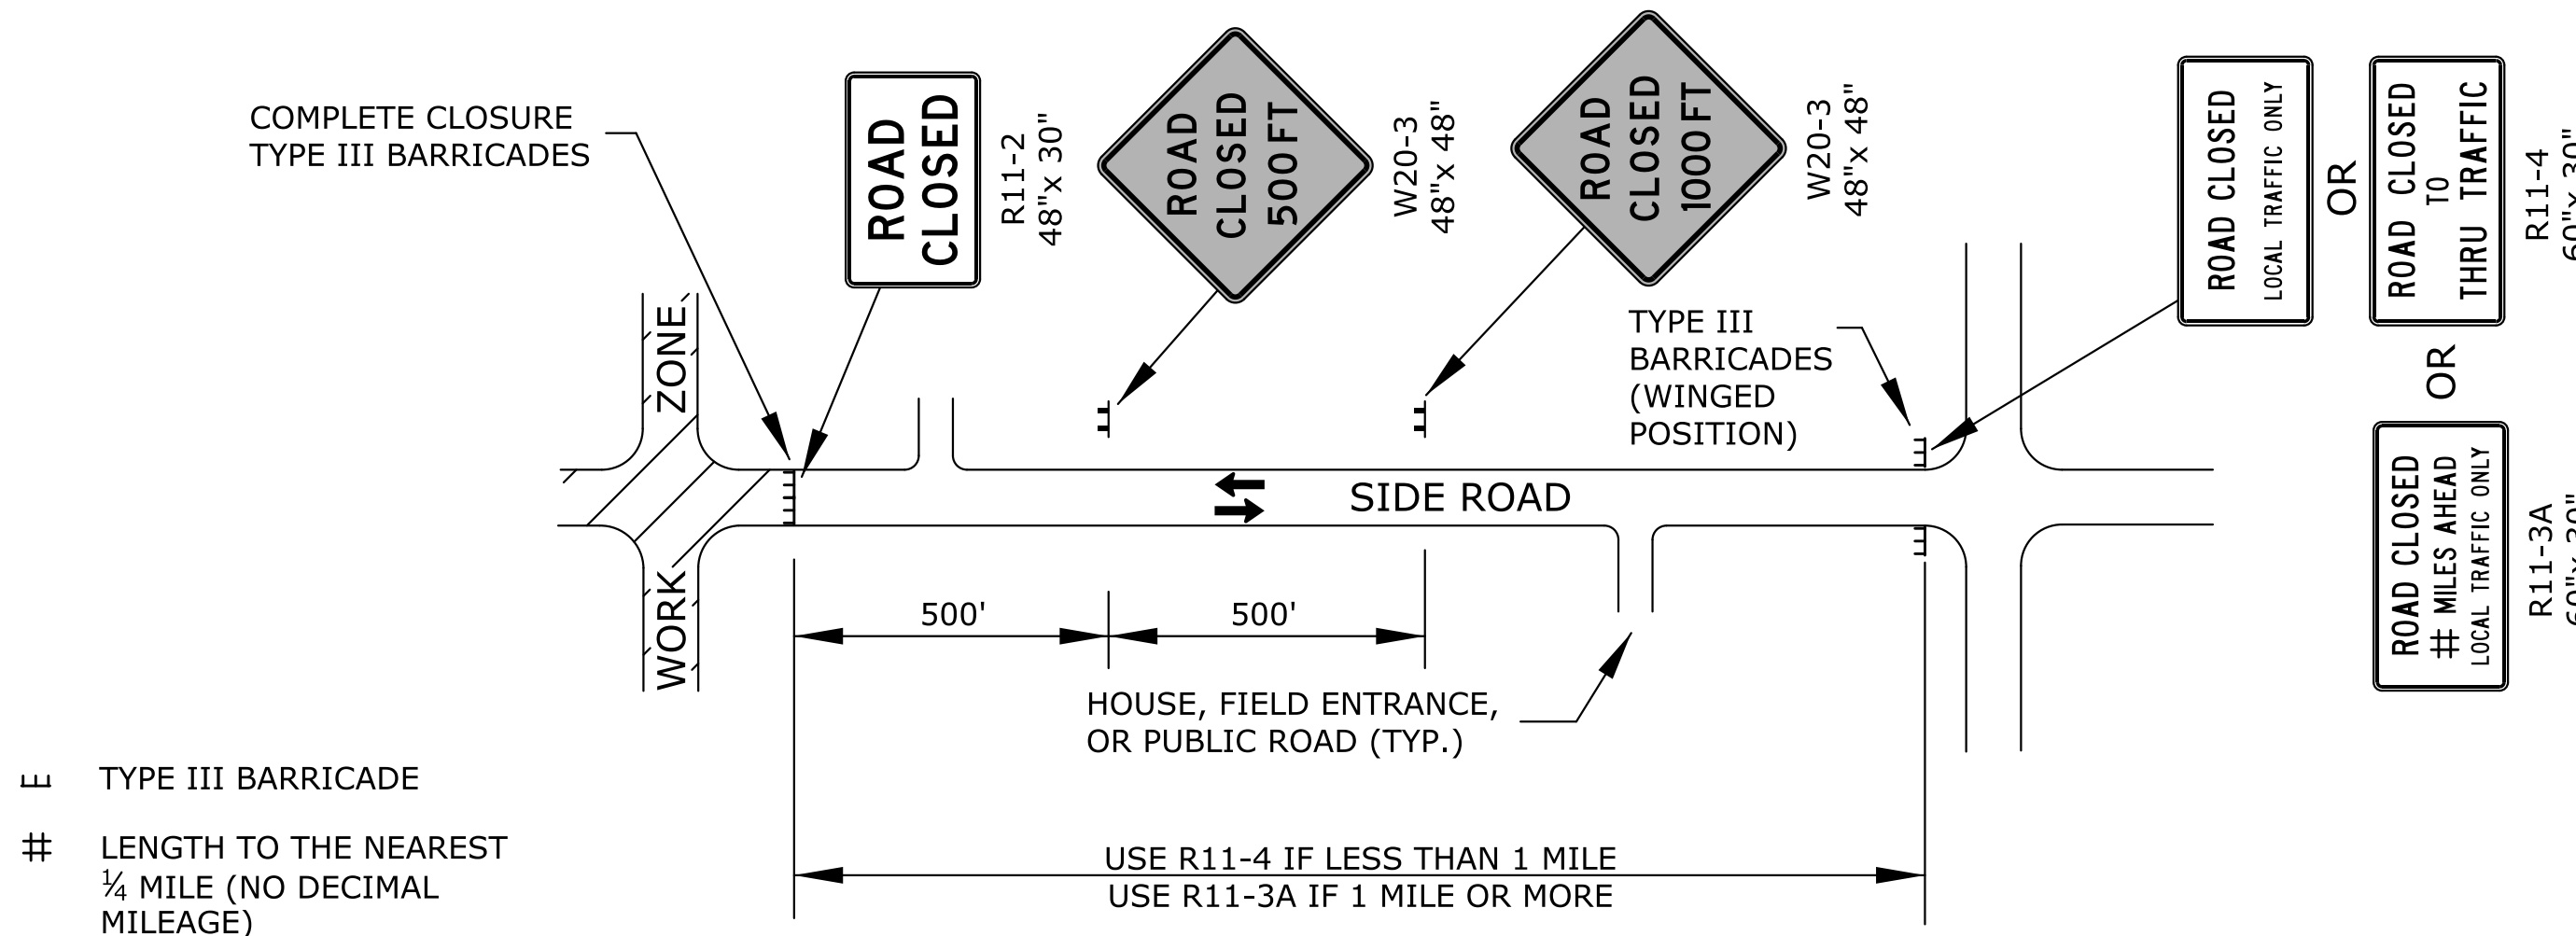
TYPICAL SIGNING FOR SIDE ROAD CLOSED
